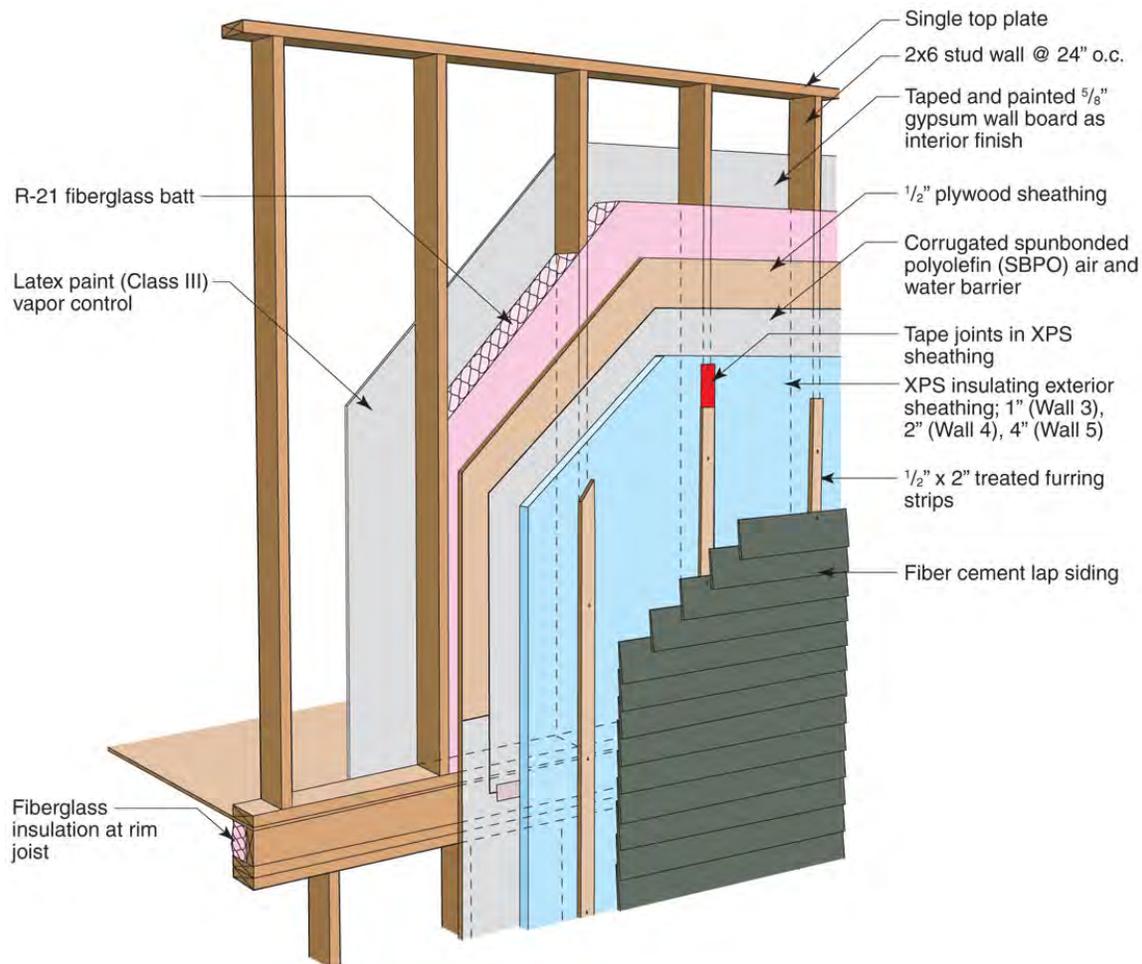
2x6 advanced framing construction with exterior XPS insulation
